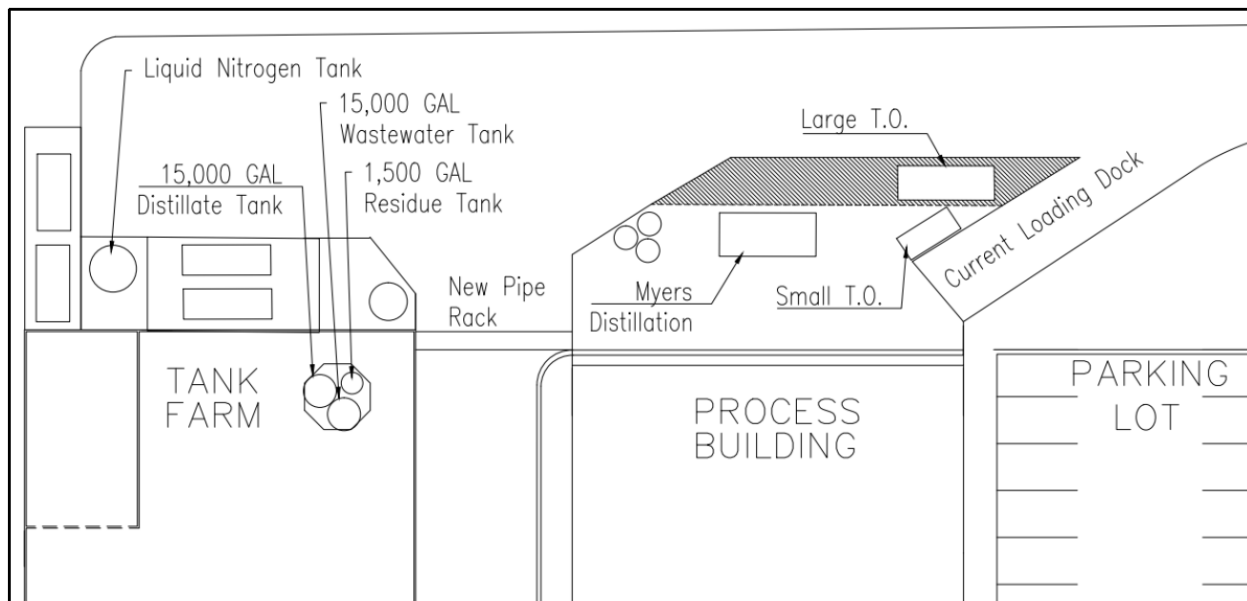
Proposed Site Plan for Distillation Systems at Ever Cat Fuels
